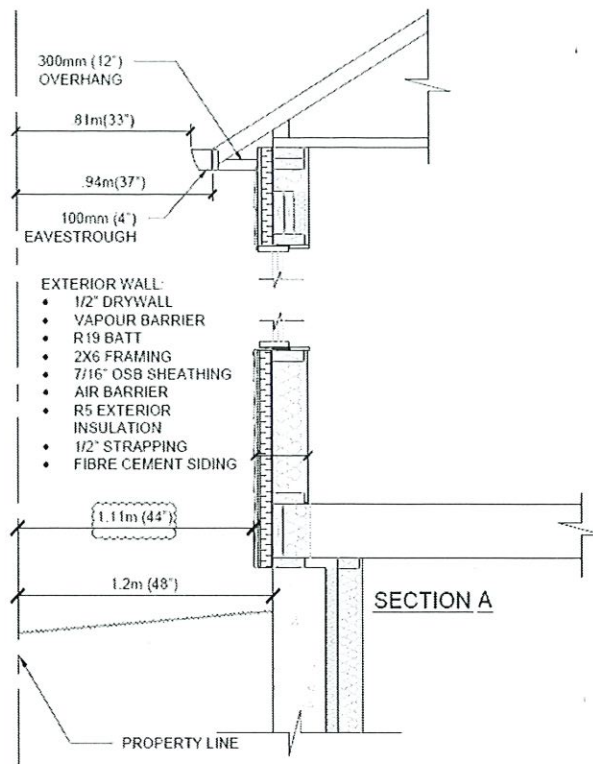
Partial wall section at the 1.2m setback indicated on the site plan.
